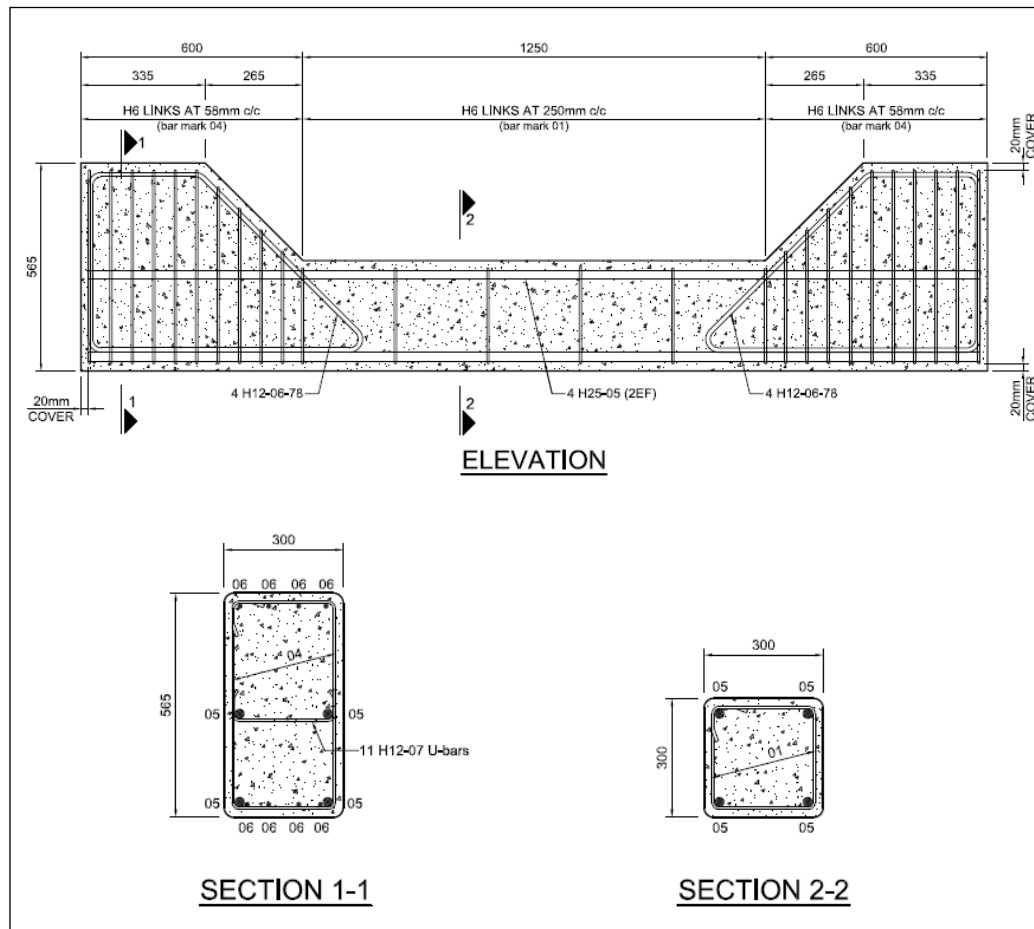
Medium-scale control specimen – Corbel column (loading profile ECC2)
